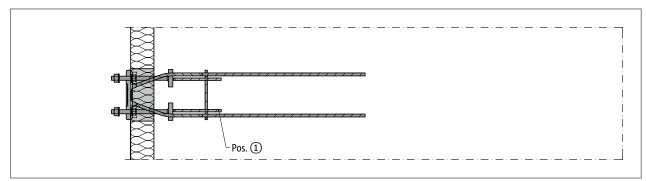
Schöck Isokorb® T type SQ: On-site reinforcement: Plan view
